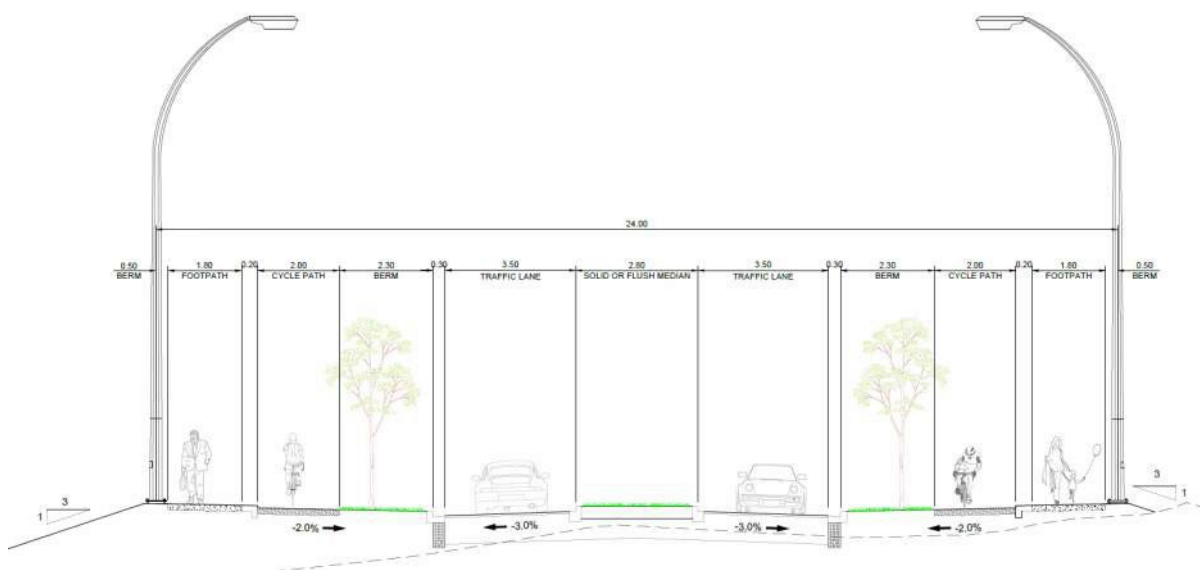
Typical Cross Section for Ponga Road included within the Drury Arterial Network DBC
